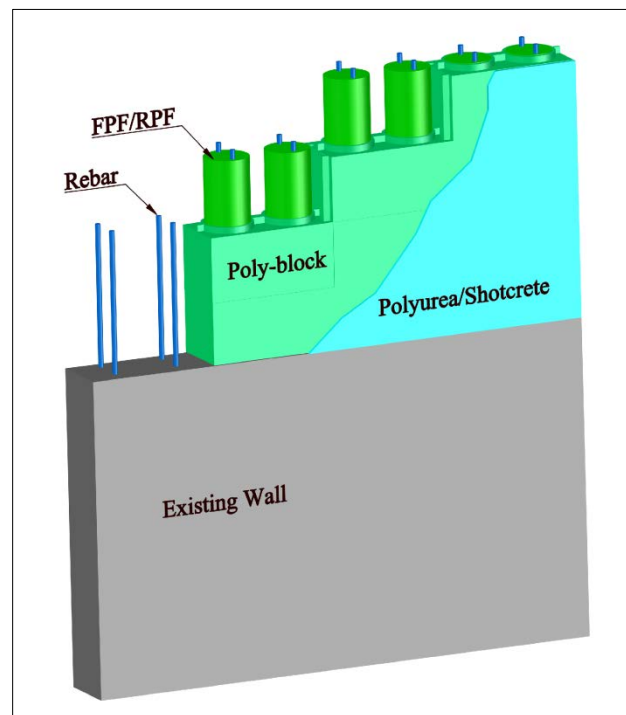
Poly-wall/flexi-wall structural system built on existing sound wall
